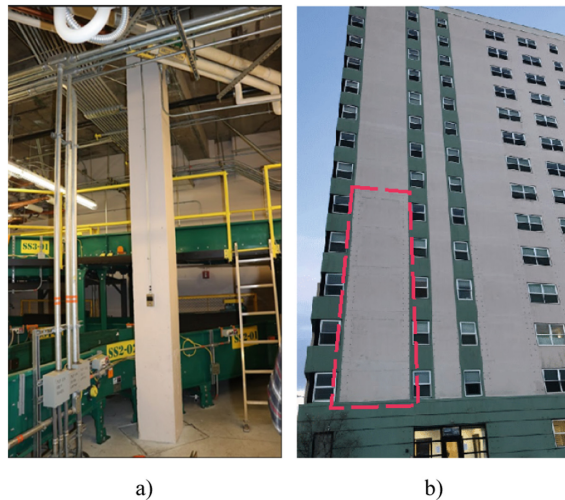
Examples of typical EBFPR retrofits: a) interior column at TSIA; b) shear wall at MKT retrofitted with GFRP (marked by a dashed red line).
